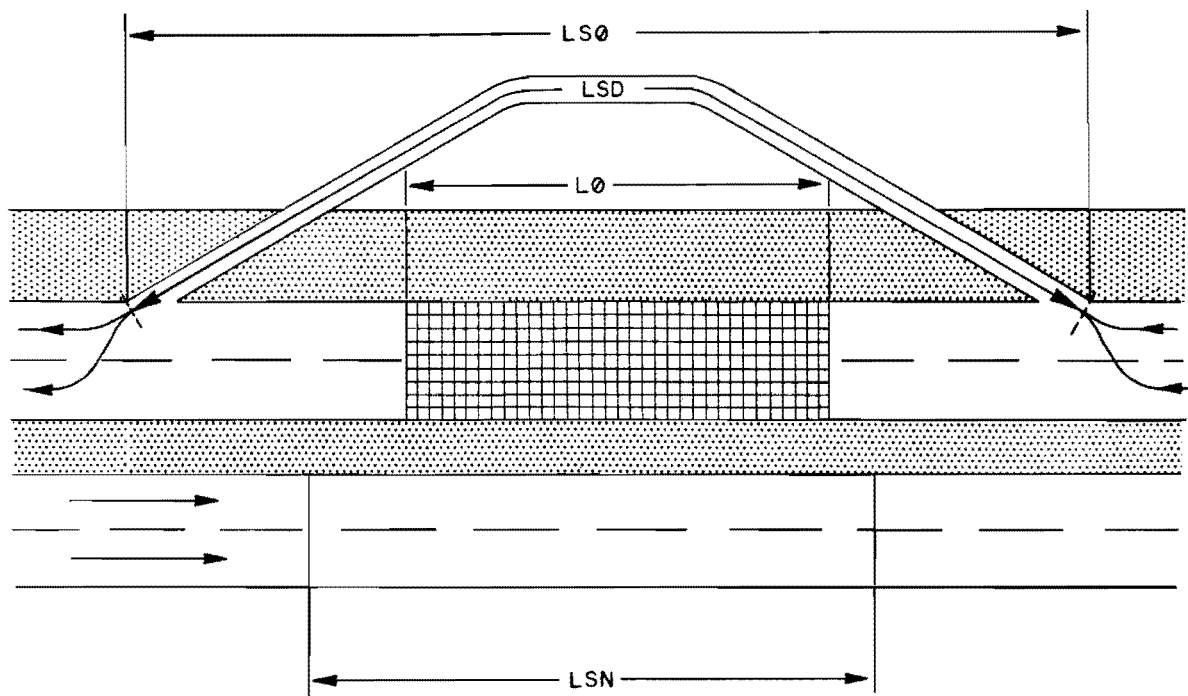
Method V: overlay direction traffic routed to frontage road or other parallel route.
